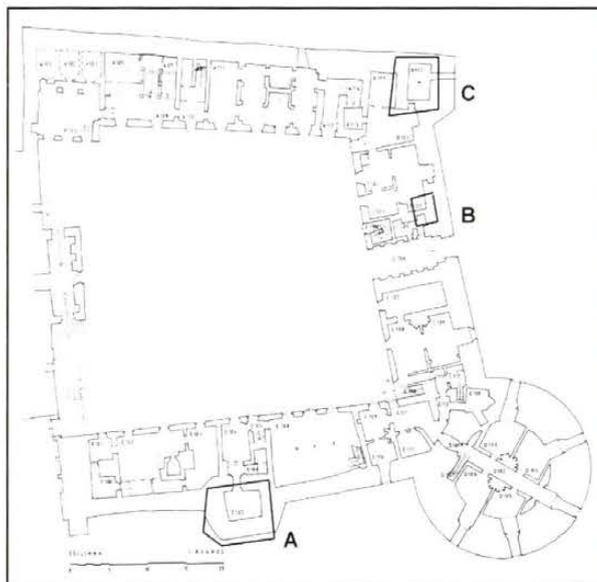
Older timber structures and earth layers discovered beneath the walls of the east outer bailey of Turku Castle. A=south tower area, B=north side of the gate tower, C=northeast tower. (Archives of the Dept. of Monuments and Sites, NBA. Turku Castle. Redrawn by K. Uotila).
